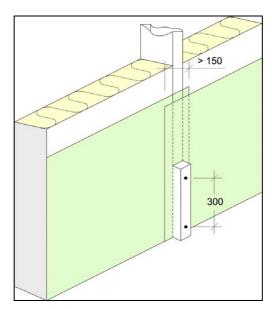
Plastic or paper-based foil air barrier's extension in timber-framed external wall construction.
